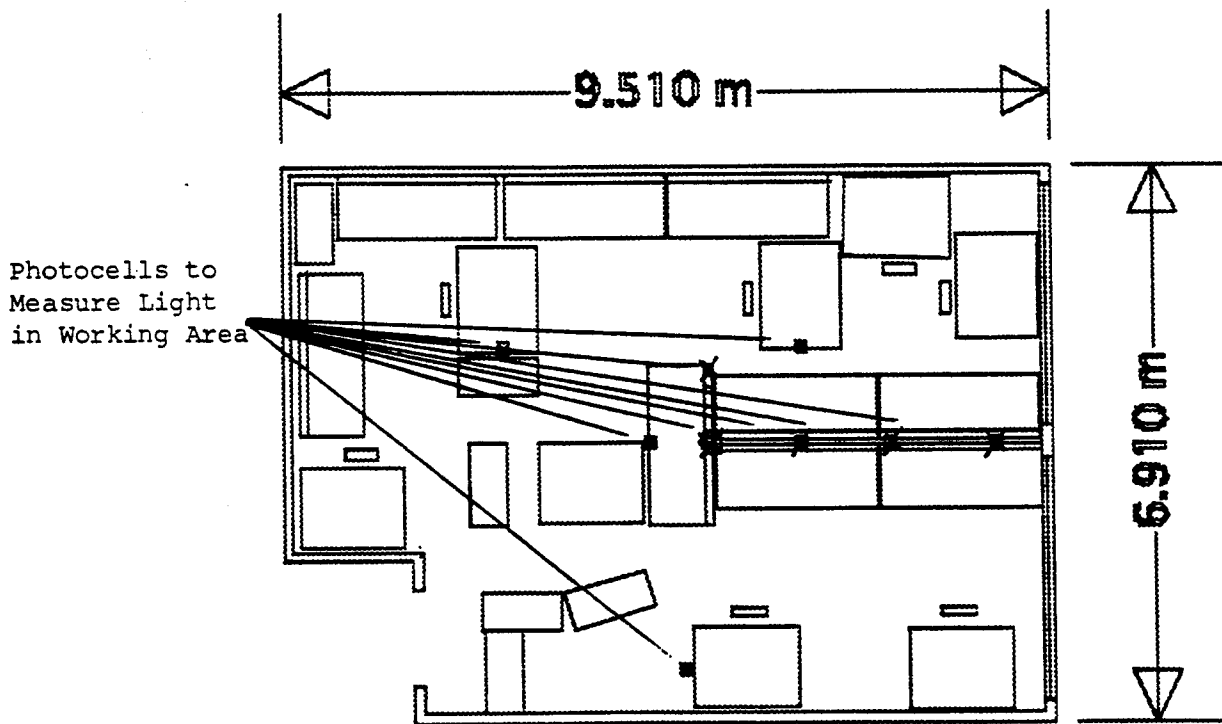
Plan of dimming test area at the Professional Faculties Building.
